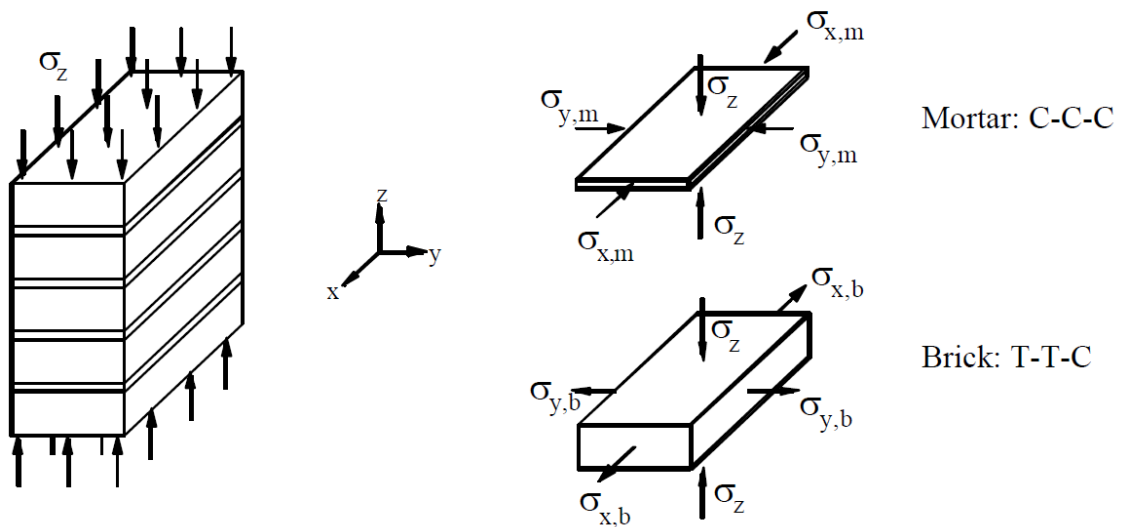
Masonry prism under compressive loading vertical to bed joints and stress states of brick and mortar elements (C: compression; T: tension) (Oliveira 2003)
